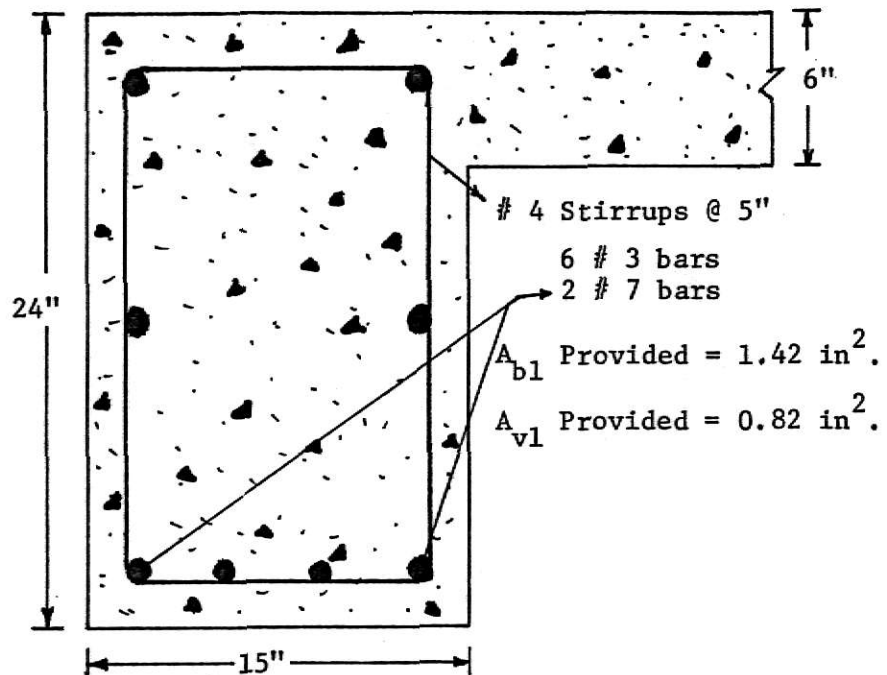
Section showing Reinforcement by Lessig's Method
